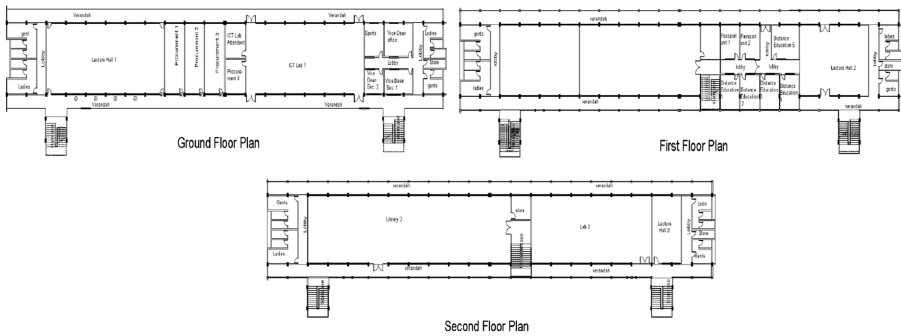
Floor plans of the conventional building model (ground-, first- and second-floor plans)
